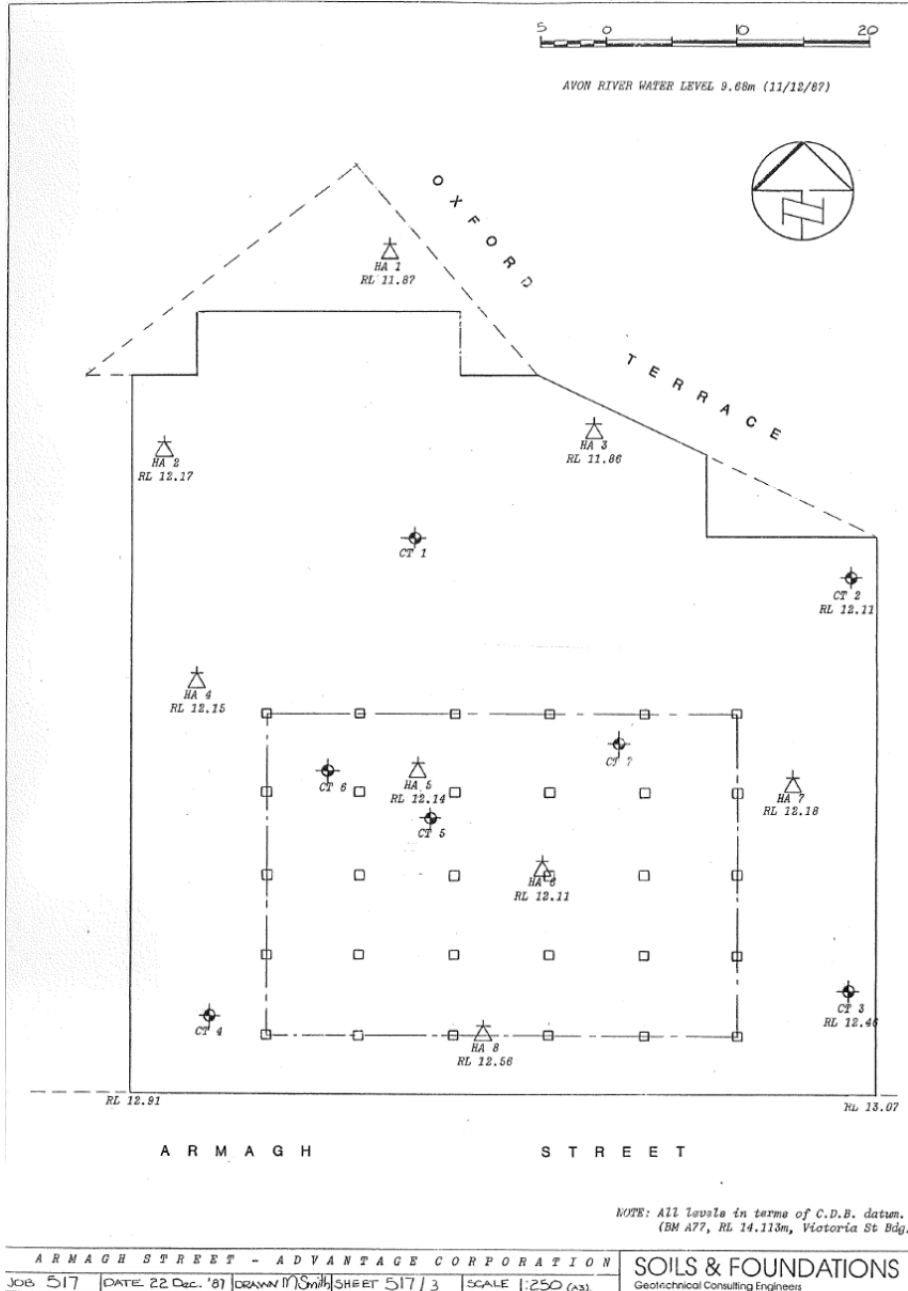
PWC Building site with foundation elements and CPT locations (with depths).
